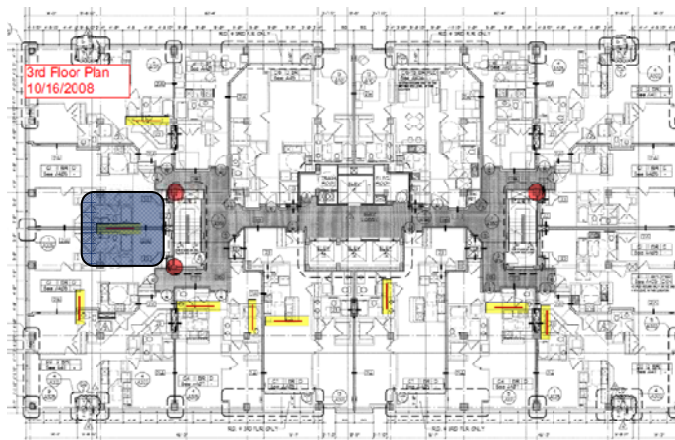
3rd floor plan showing reinforcing for soffit of 4th floor, area for analysis shown in blue
